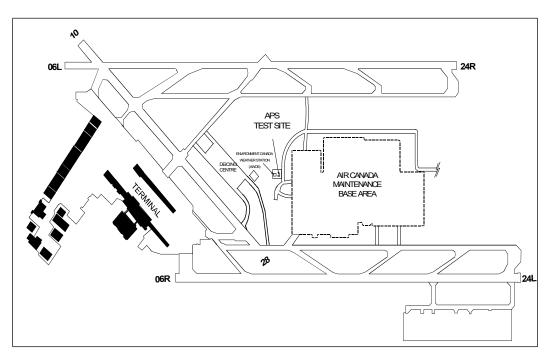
Plan View of APS Montréal–Pierre Elliott Trudeau International Airport Test Site
